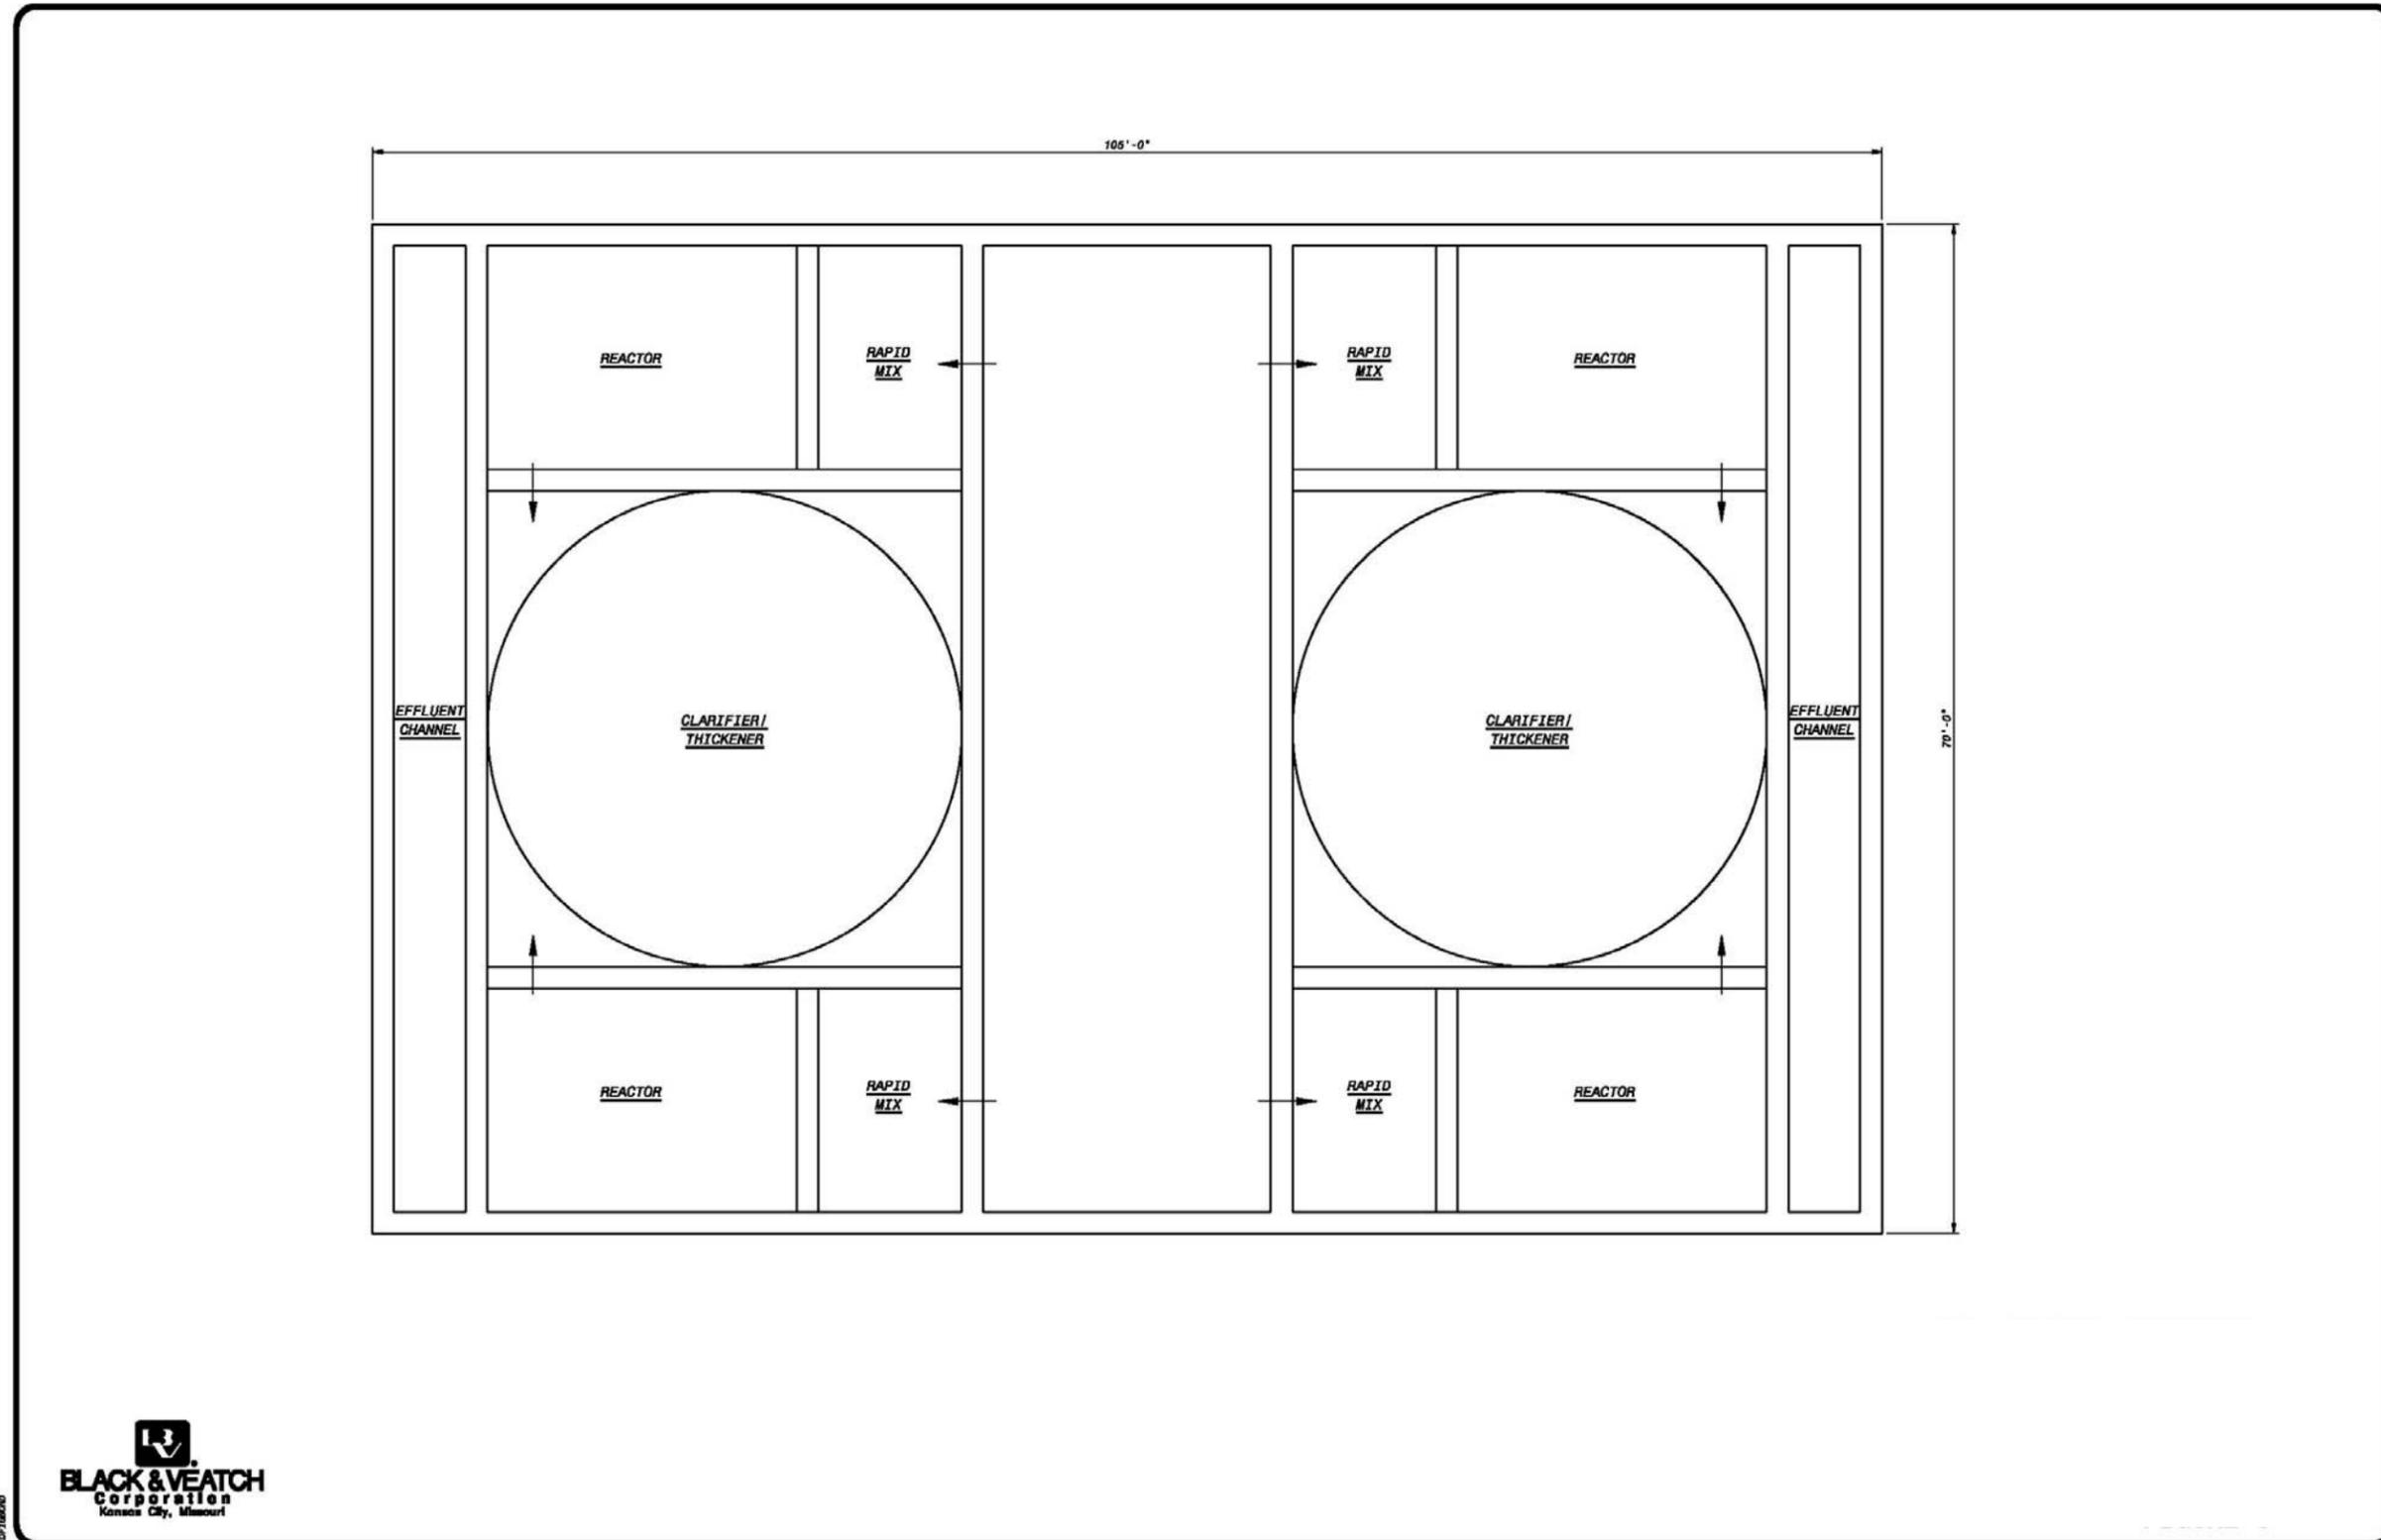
Preliminary Layout of Sludge Recirculation HRC Facility
